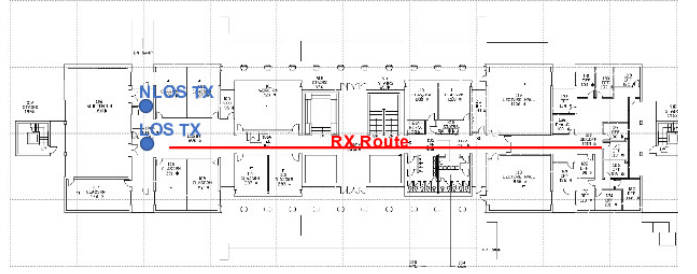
Floor plan for 1st floor (each grid corresponds to 10m)
